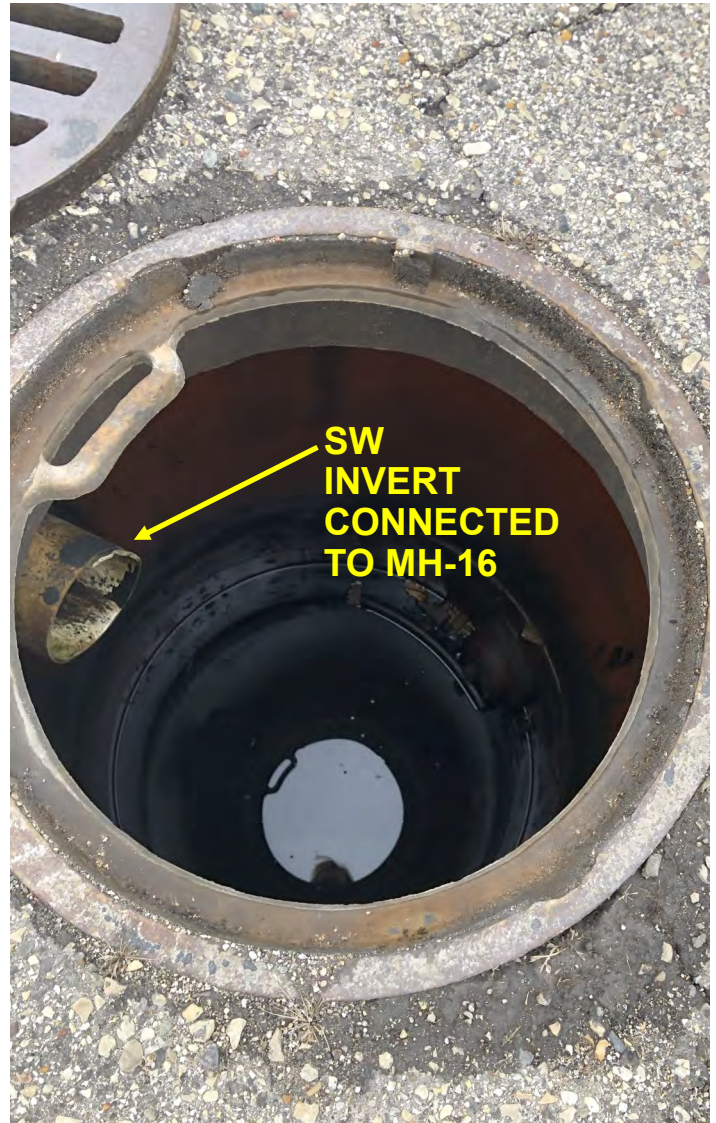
Manhole MH-13 interior with visible SW invert connected to manhole MH-16. View to northwest; photograph taken on April 4, 2022.
